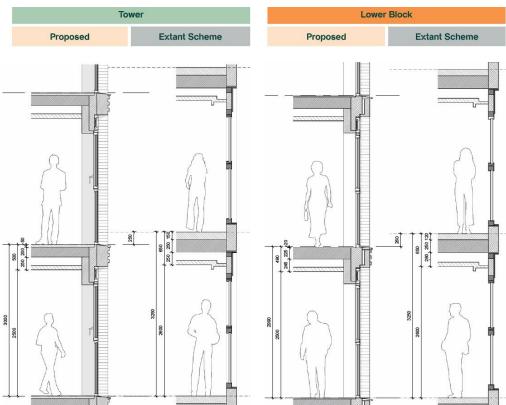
floor-to-floor heights for the approved (extant) and proposed developments
